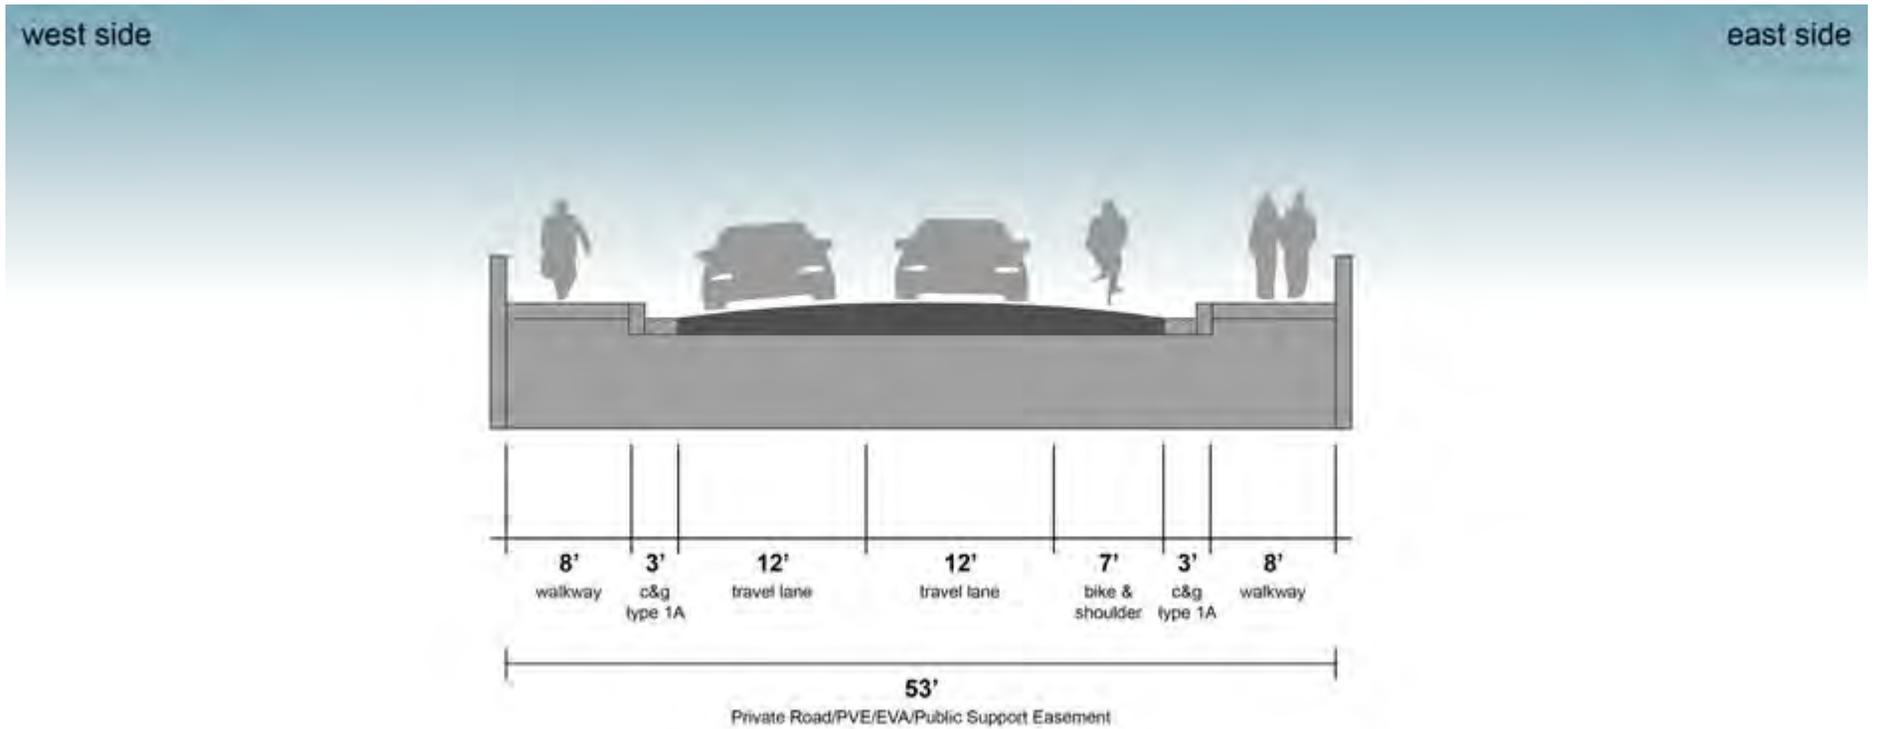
SECTION J: FAR EAST ROAD BRIDGE
